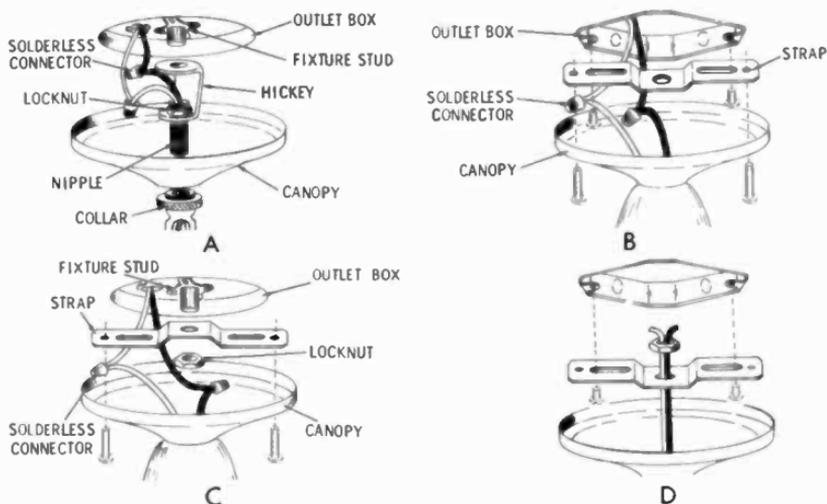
Methods of mounting a fixture to a ceiling box. *A* shows center nipple of fixture connected to center nipple of box. A “hickey” is used to allow the wires to feed out of the fixture nipple. Fixtures with wide-spaced mounting screws are fastened to a strap which has been fastened to the more closely spaced screws of the ceiling box (*B*). In *C* the strap is turned around and fastened to the nipple on the box. In *D* an adapter strap is used to fasten a fixture with a center nipple to a box without a nipple.
